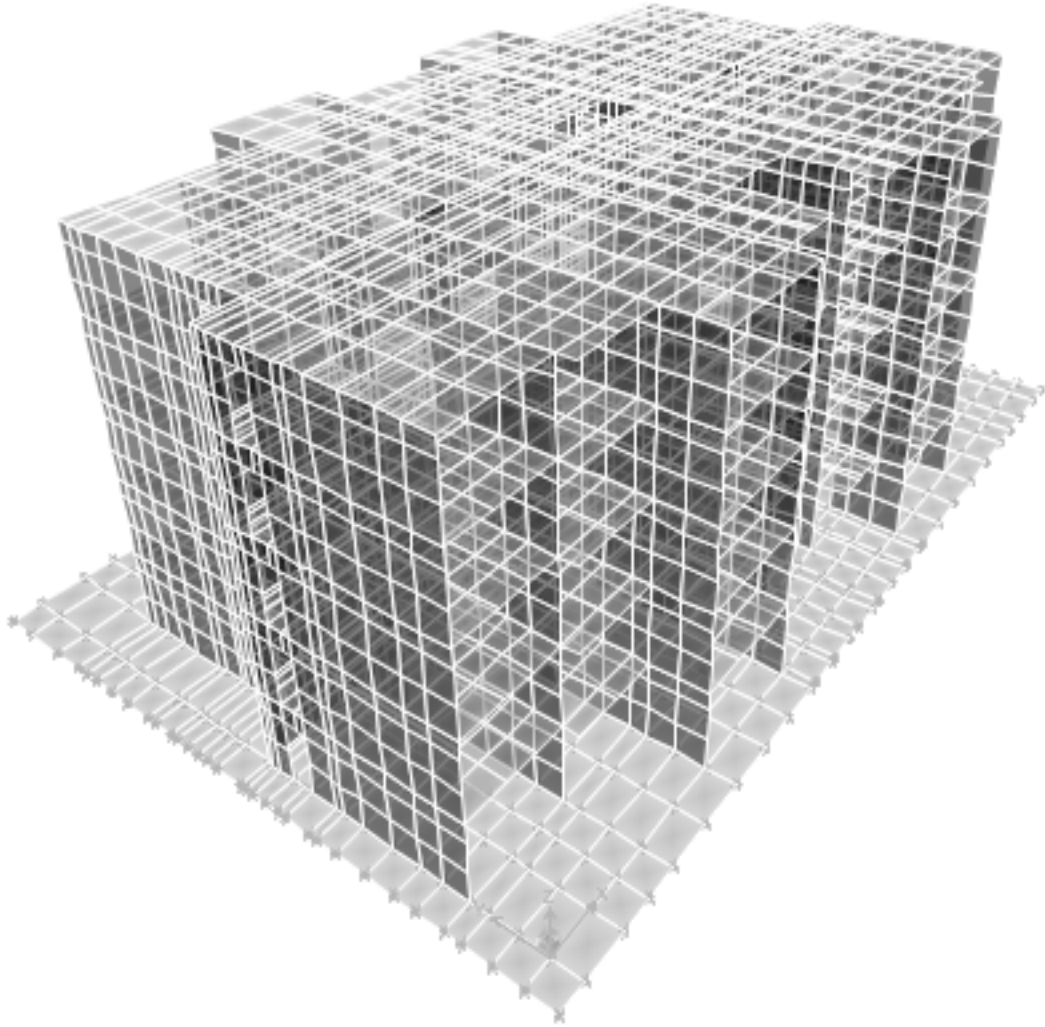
Typical three-dimensional mesh modeling for five-shear-wall dominant building (Plan No. 2)
